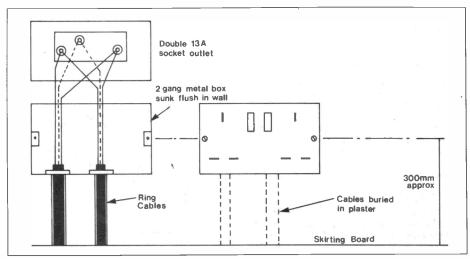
Fixing and connecting a ring socket outlet on the wall above a skirting board.
